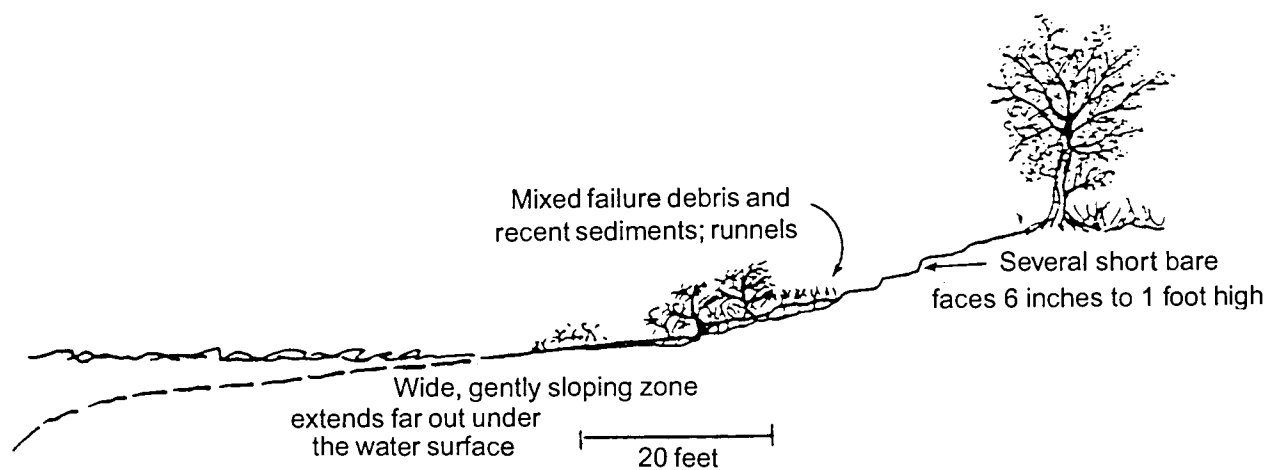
shows a “Type 3 site: The type 3 site included a gently sloping lower bank bench and wide berm of recently deposited sediments and failed soils from upper bank collapse. Typically, this area of failed soil accumulations was 3 to 4 feet high on a slope of approximately 1 vertical on 4 horizontal. Above the berm a nearly vertical bare face 1 to 3 feet high was encountered. Pronounced runnels cut through middle bank berms. Tree roots were typically exposed within upper bank faces” (page 24).
